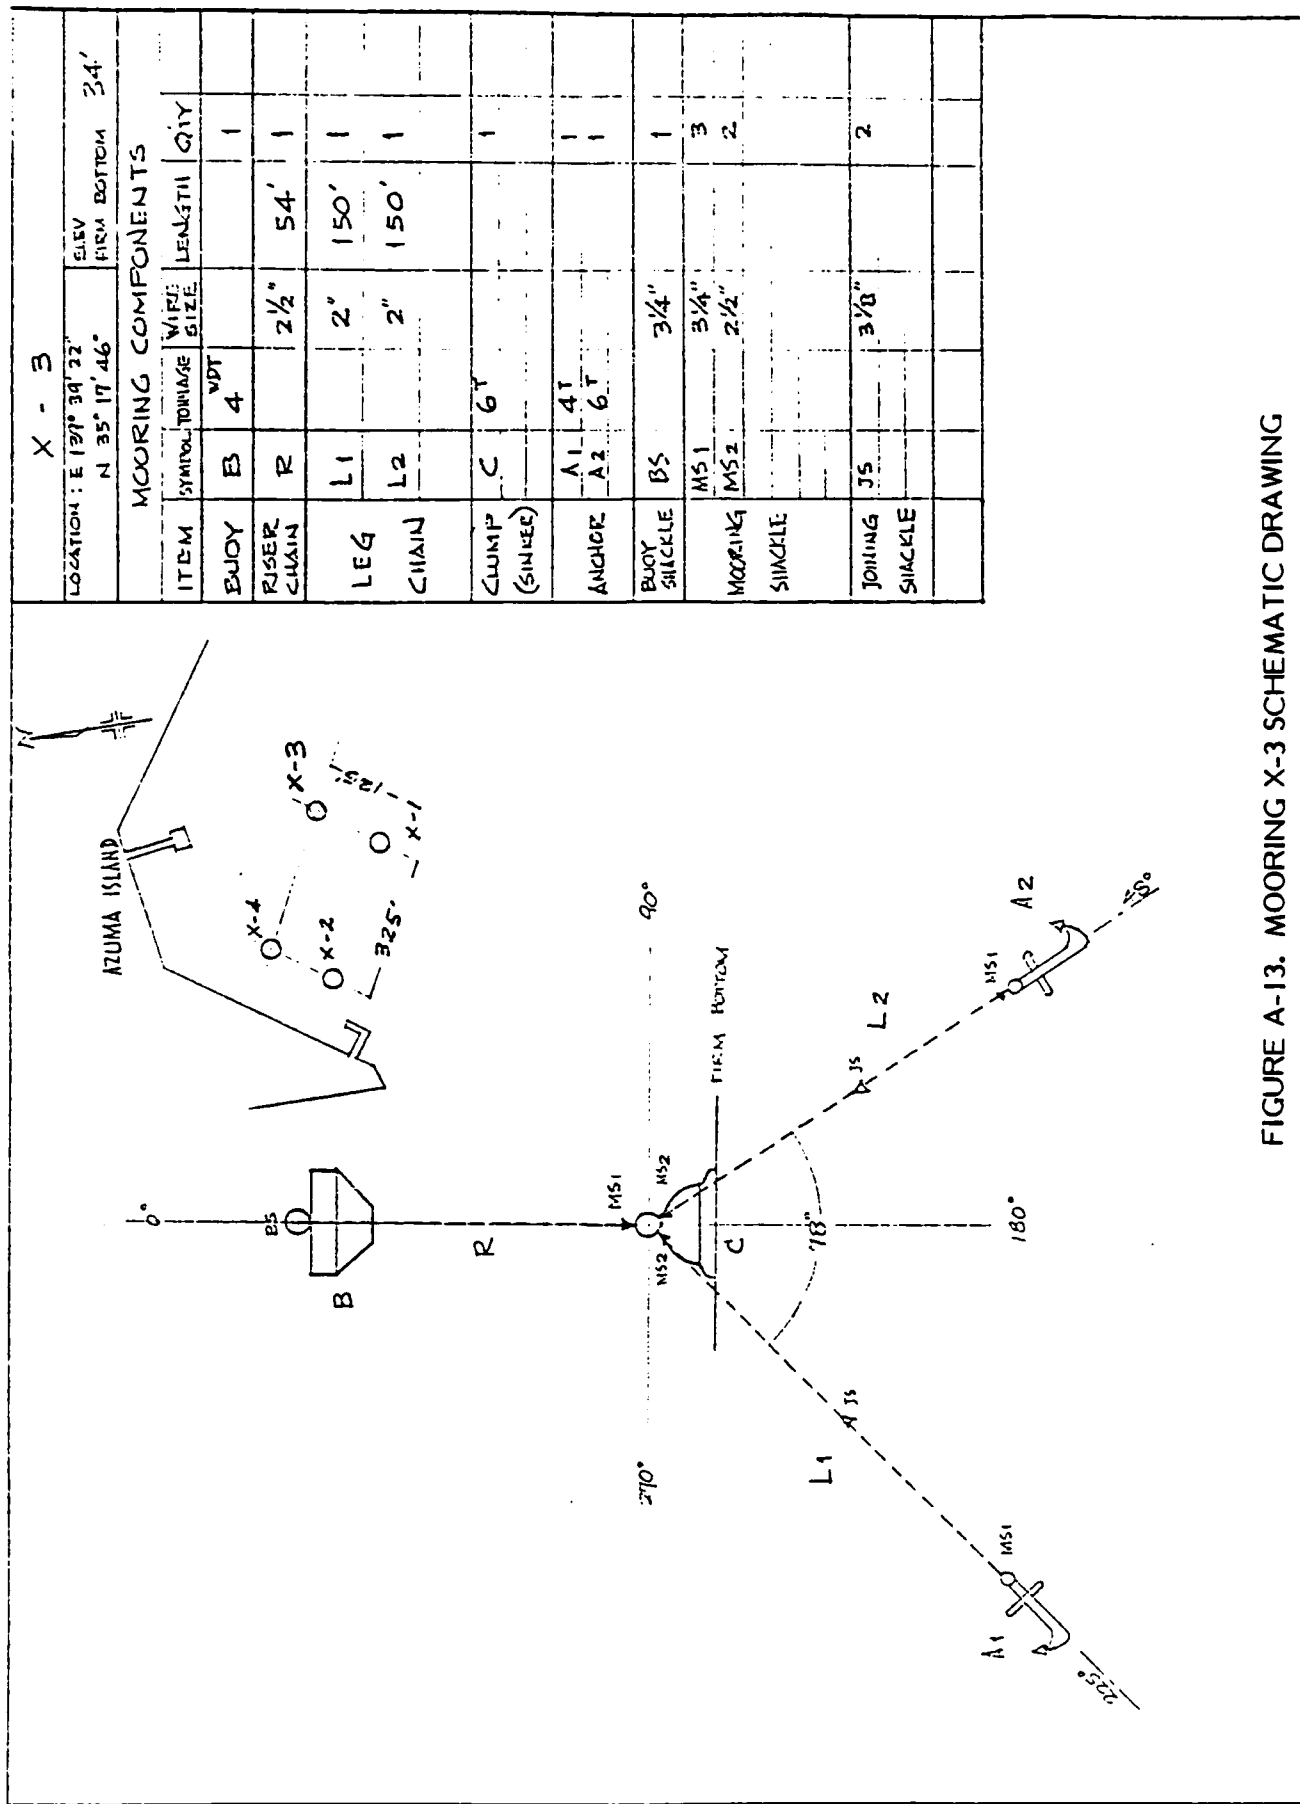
MOORING X-3 SCHEMATIC DRAWING
